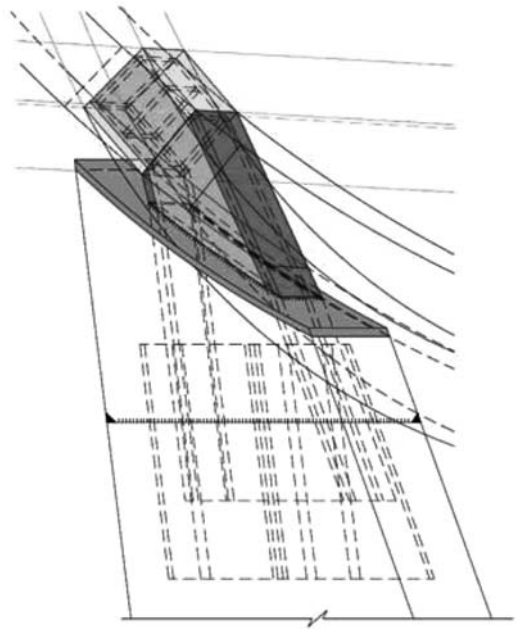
Pier 3D sketch. Notice the transfer element between the smaller section and the complete pier section.
